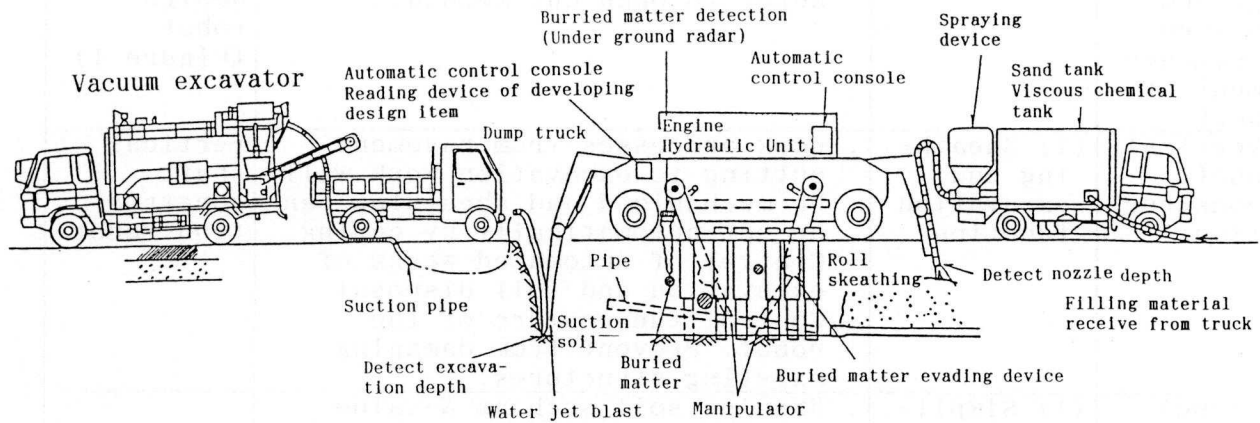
Excavation, Sheathing, Pipe Setting Backfill Robot
